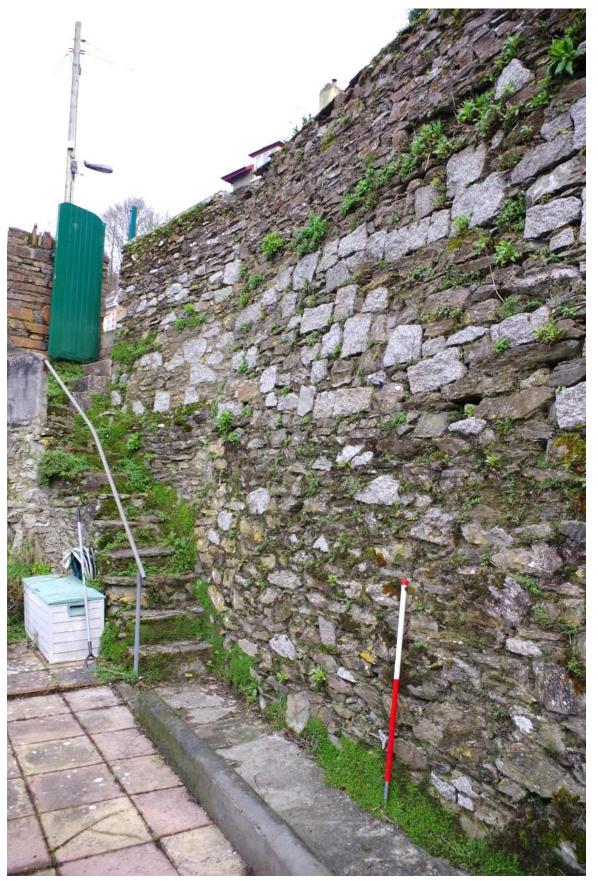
Sections O (right) and P (left), west elevations in January 2021 prior to erection of scaffolding.
